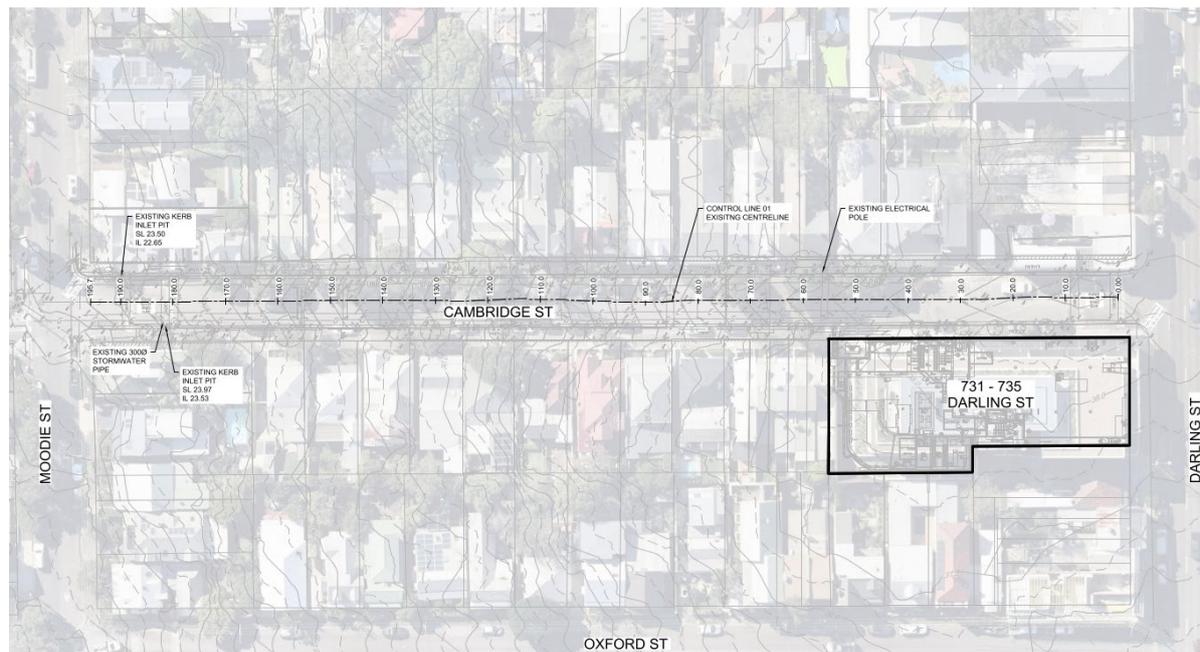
Existing Overall Layout Plan (aerial) of the proposed stormwater pipelines (Source: Submitted Plans, prepared by Samana Blue Engineering, Drawing No: 2022007DA – C06 D, dated 13.12.2022)
